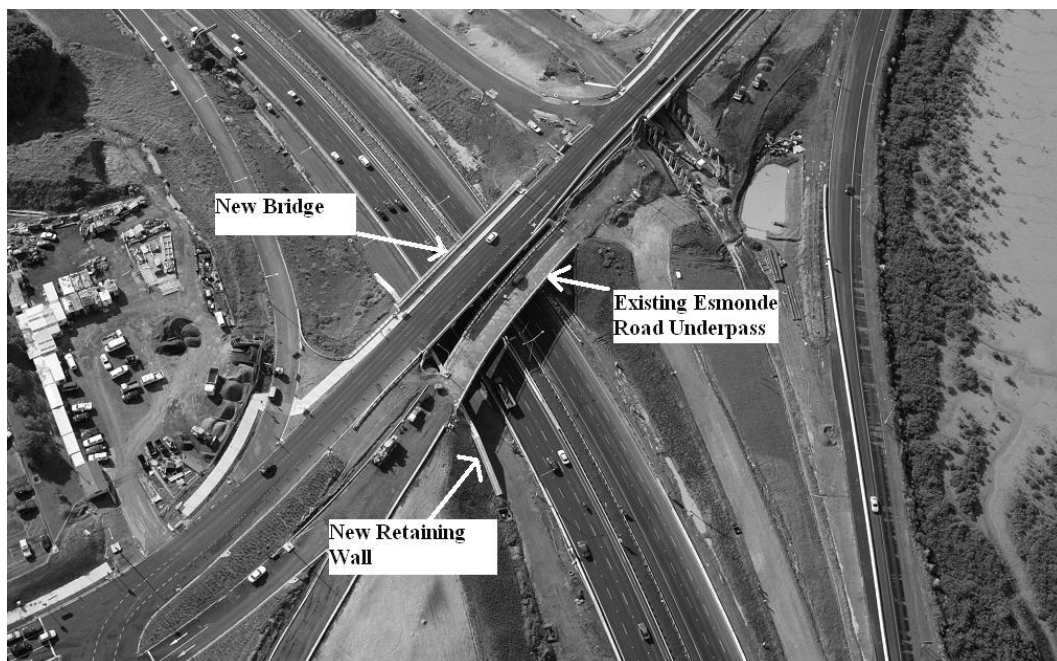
Modifications and Strengthening to the Esmonde Road Underpass
